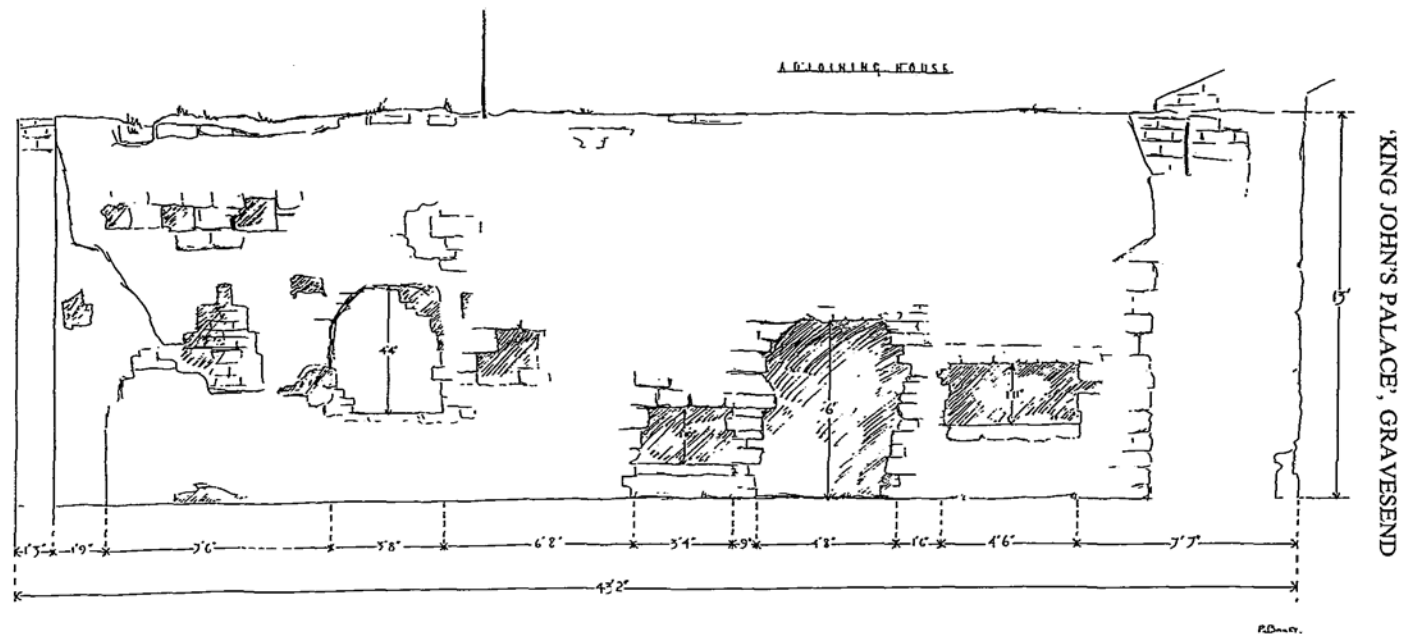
Plan of the east side of the wall with measurements (*Gravesend Historical Society*).
